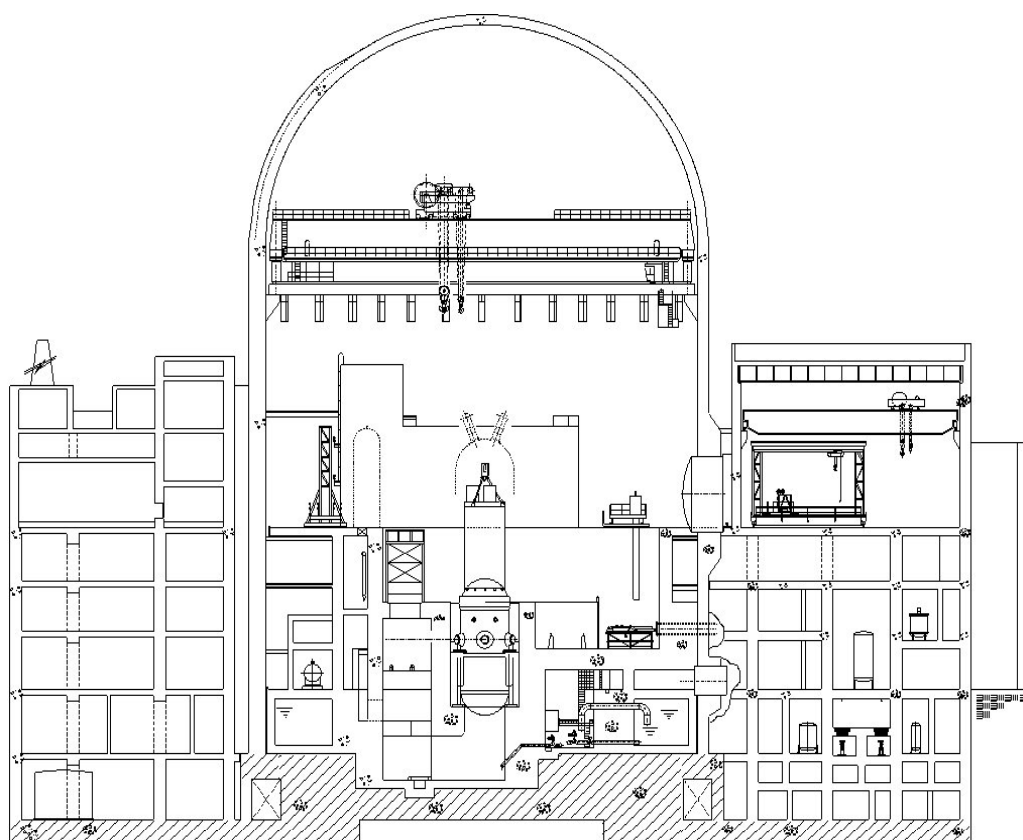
Cross-sectional view of the reactor building (vertical direction)
